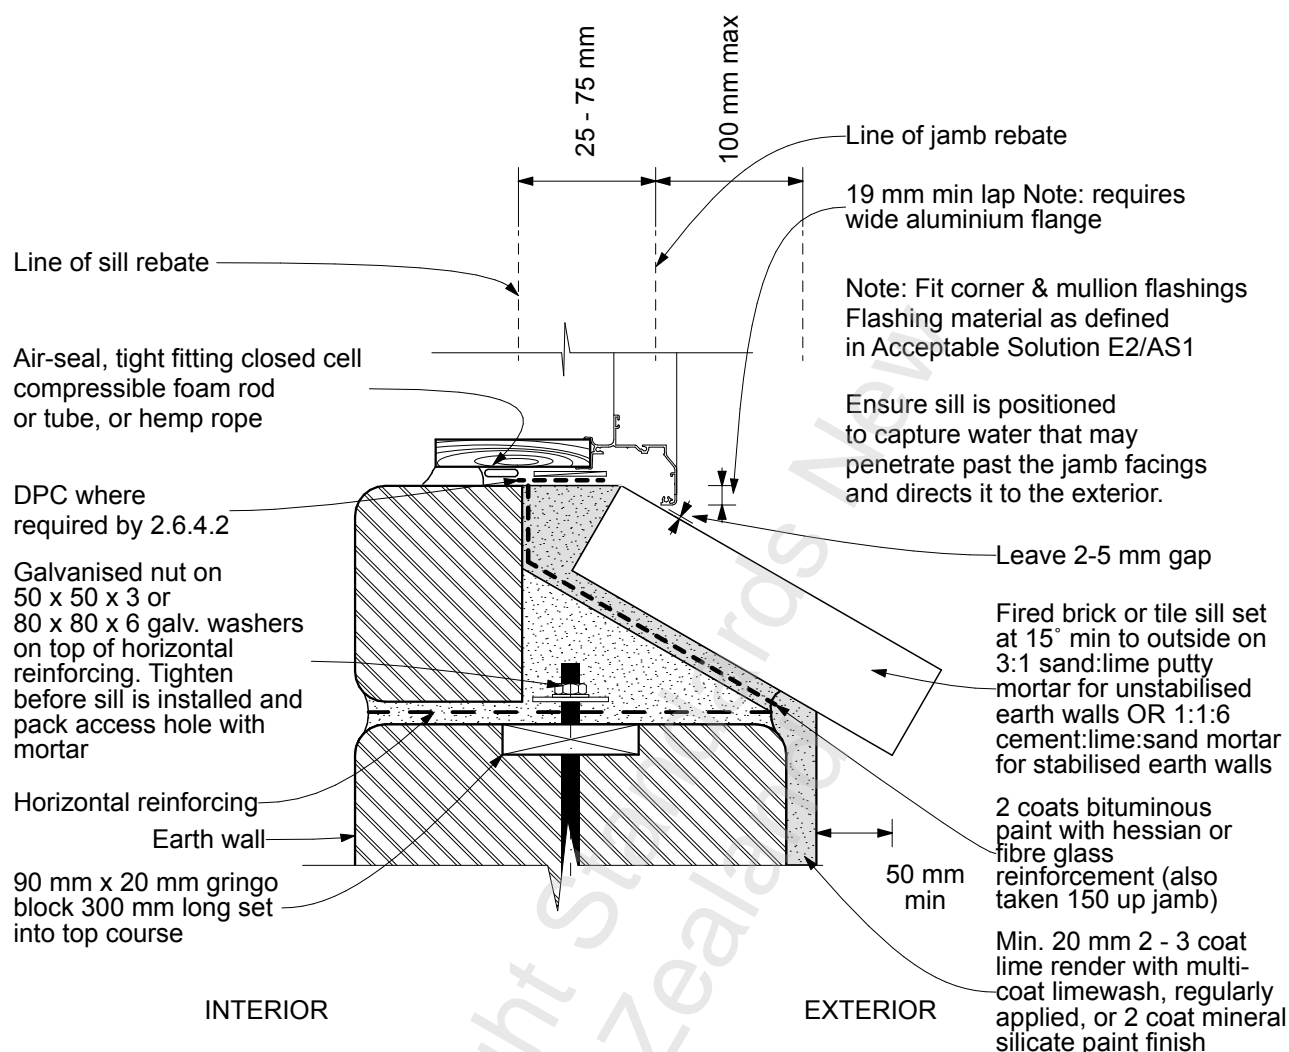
Aluminium joinery sill for lime plaster over solid earth wall
